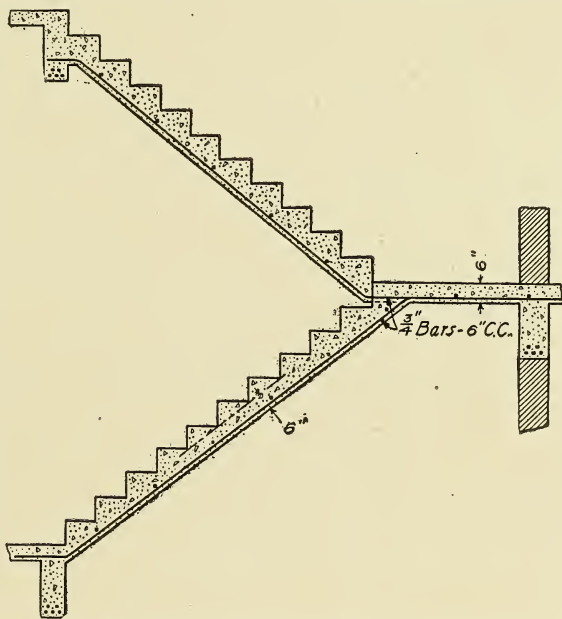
Stairs for Buck Building, Philadelphia, Pa.
